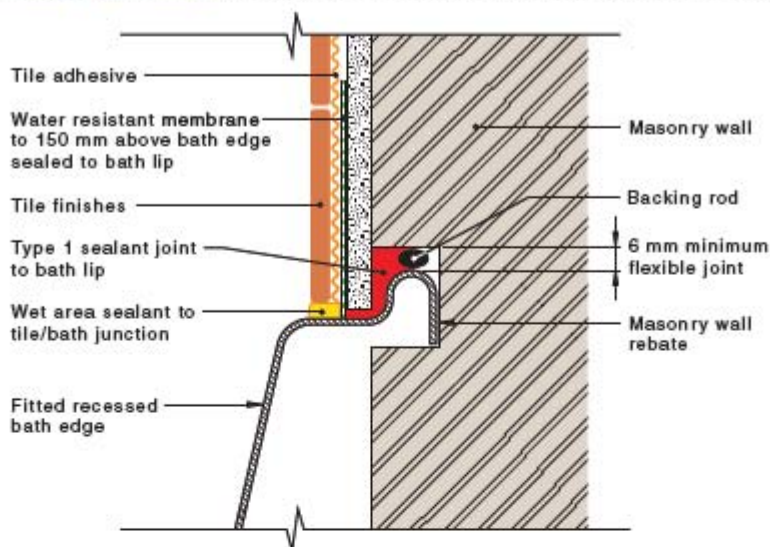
(A) — Bath with no shower over it — Fitted bath — Masonry wall
